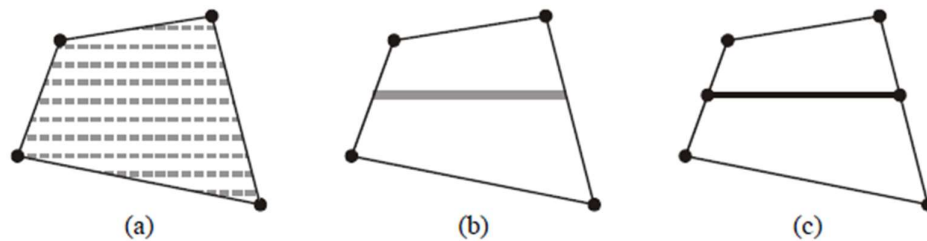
The approaches of modelling of steel reinforcement bars: (a) Smearred approach. (b) Embedded approach. (c) Discrete approach (Chong 2004)
